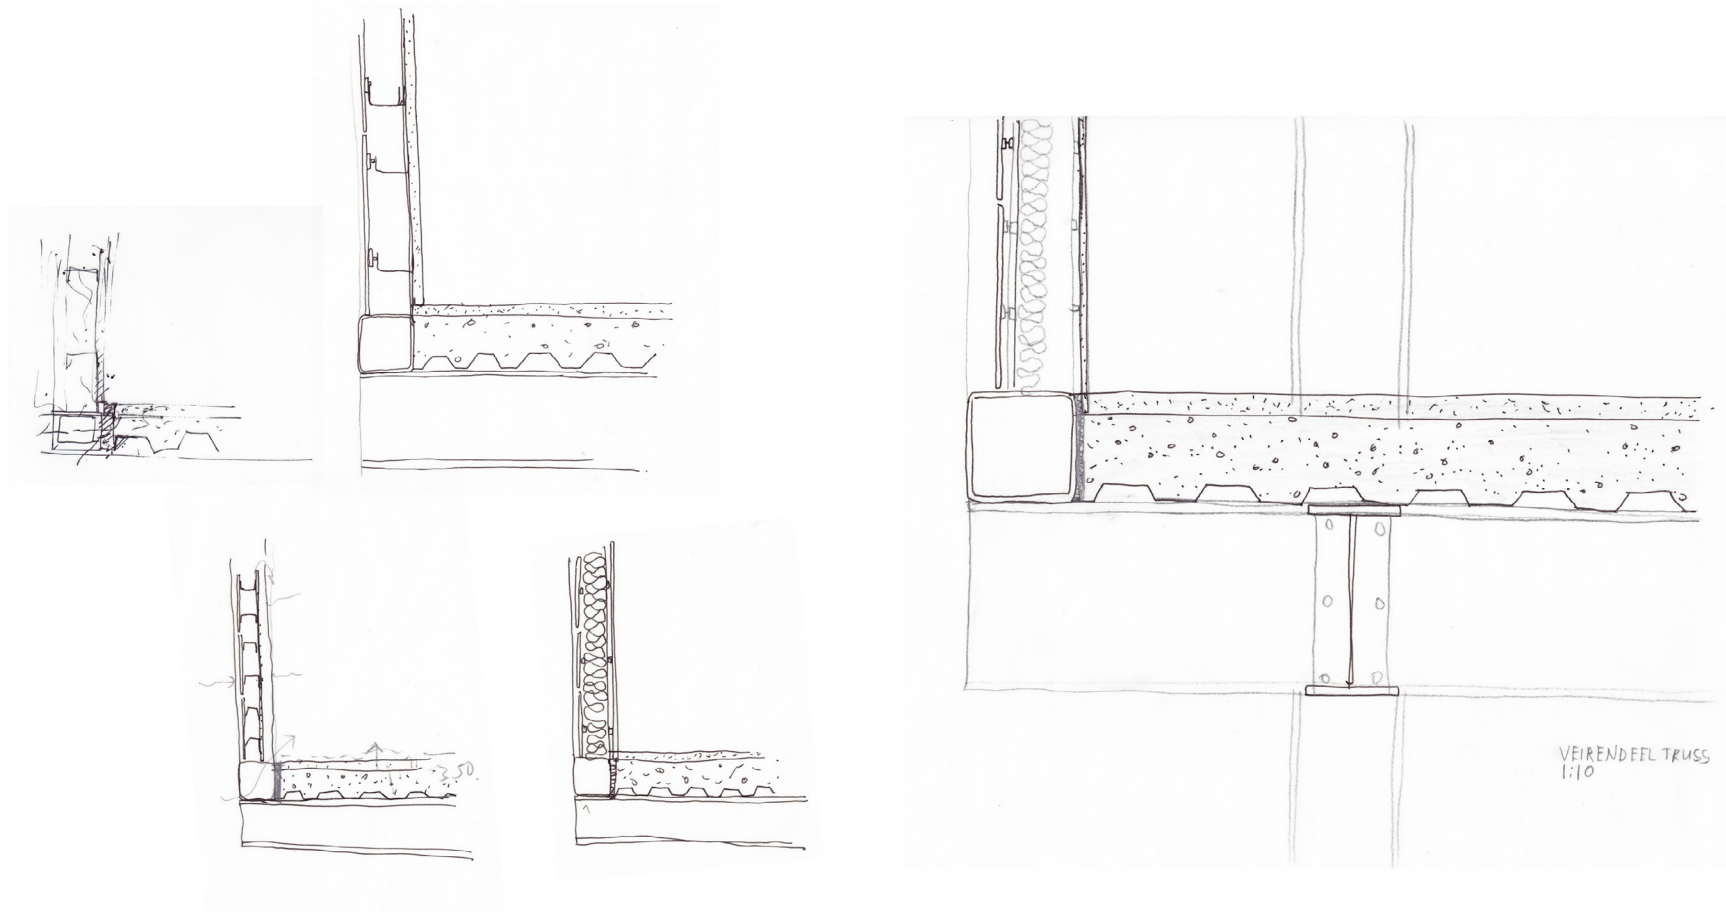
Sketches investigating junction of the Vierendeel truss, Alucobond and the pre-cast concrete floor slab, as well as looking at thermal breaks (Author, September 2016).
